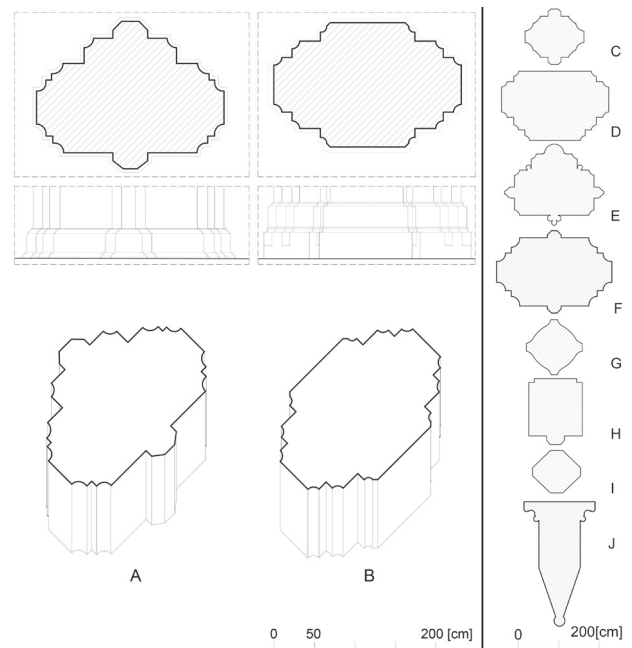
Pillars of St Elizabeth's Church in Wrocław, plan, side view of the plinth, and axonometric view of the shaft: A – nave, B – chancel. Plans of pillars of formally similar churches: C – Cistercian church in Złota Korona, D – Cistercian church in Lubiąż, E – Our Lady before Tyn church in Prague, F – parish church of St Peter and Paul in Legnica, G – St Maurice church in Soultz, H – Dominican church in České Budějovice, I – Cistercian church in Kaisheim, J – Cistercian church in Salem (body) (compiled by F. Hackemer)
